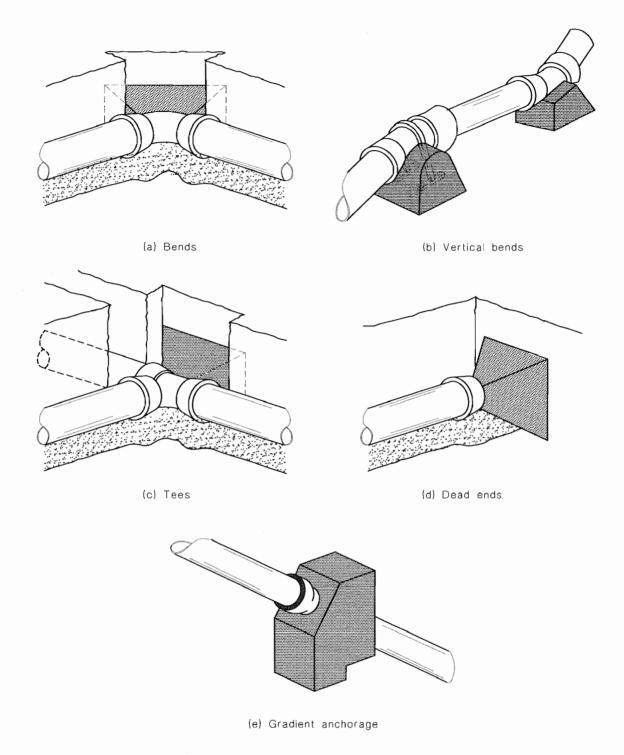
TYPICAL LOCATION OF THRUST BLOCKS
